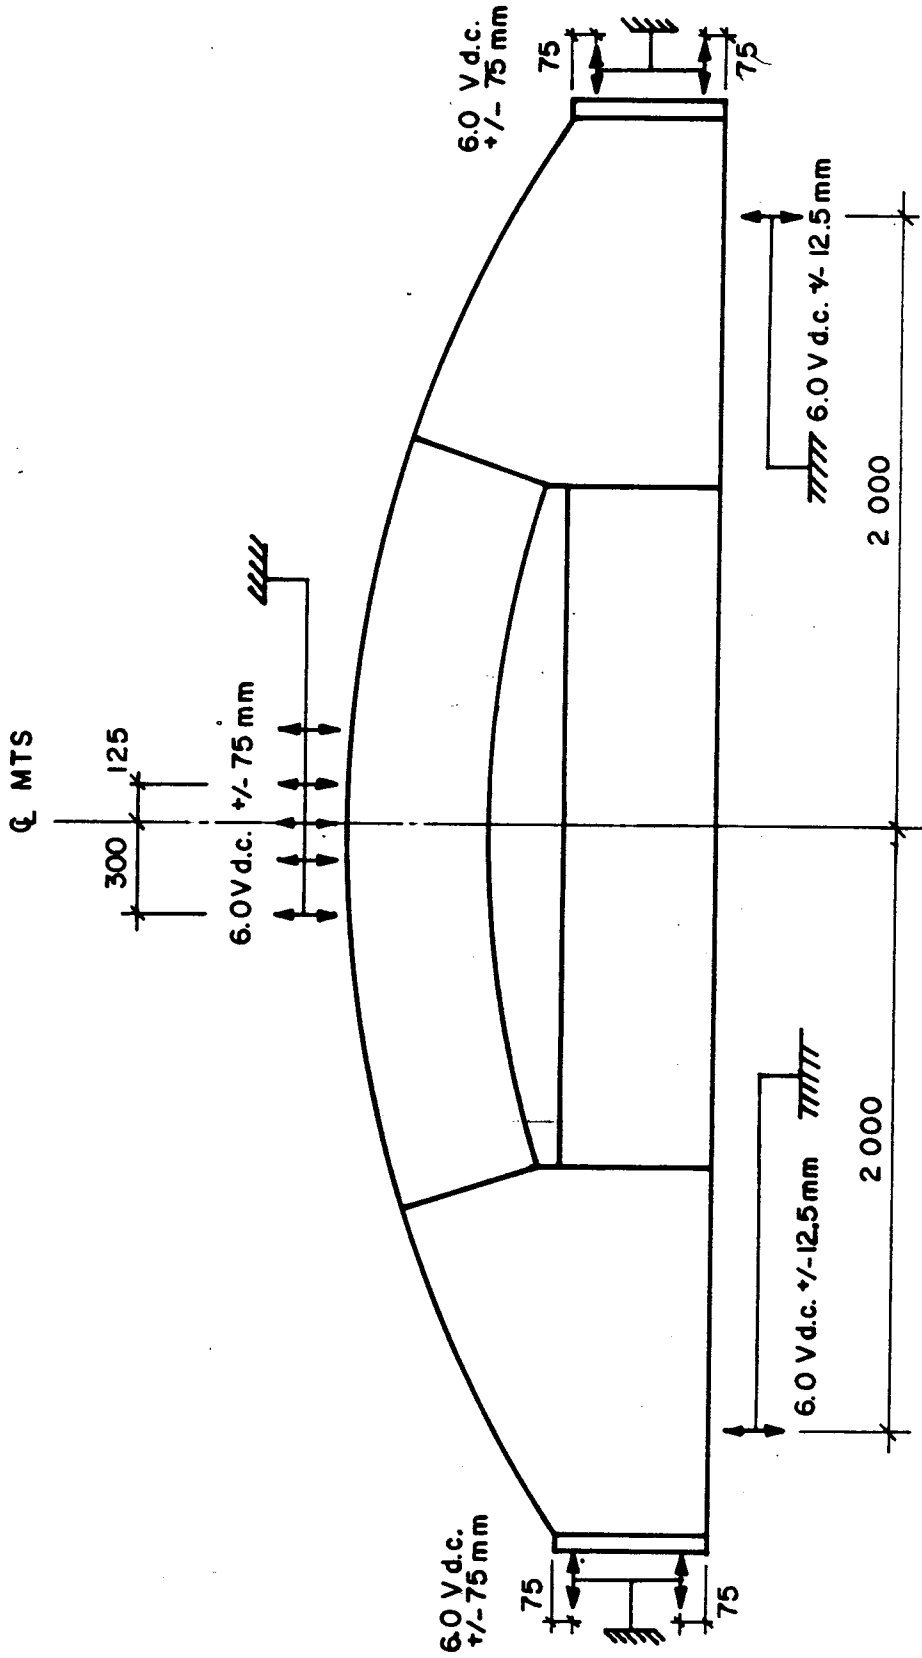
Typical Transducer Layout for Specimens P1 and P2
